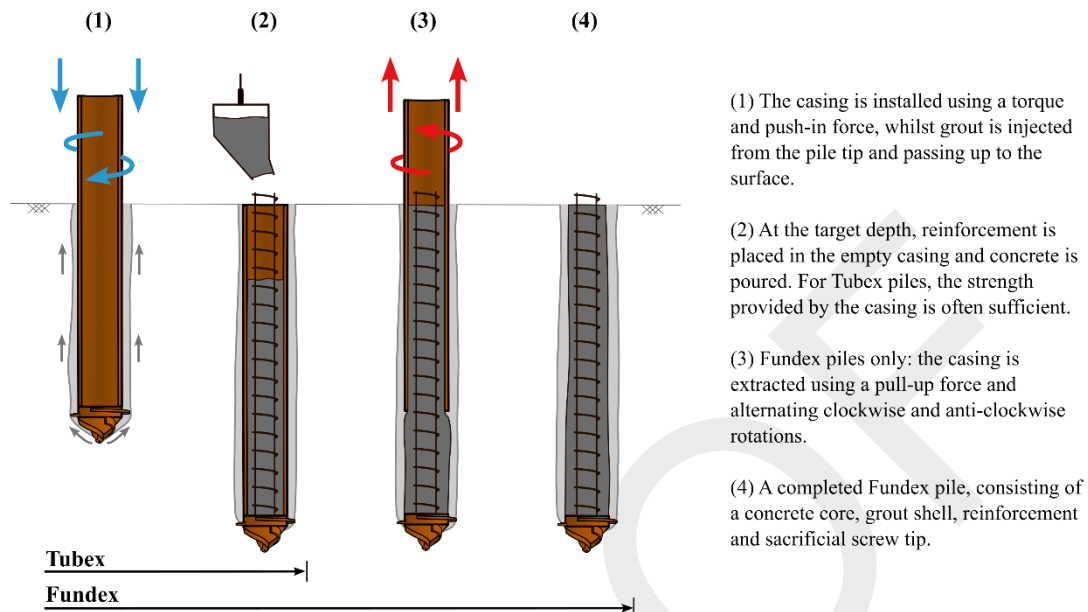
Installation of a Fundex and Tubex pile with grout injection.
